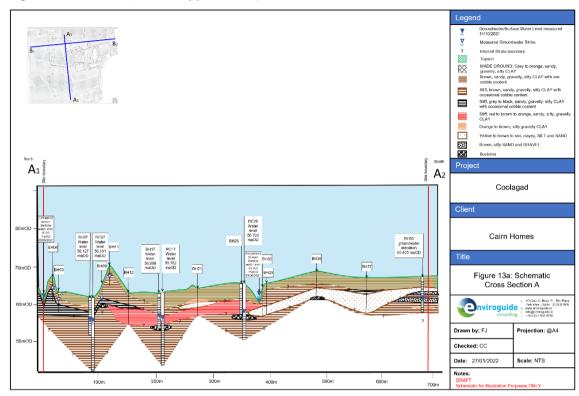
Geological Cross- Sections (North to South at the East of Site)
